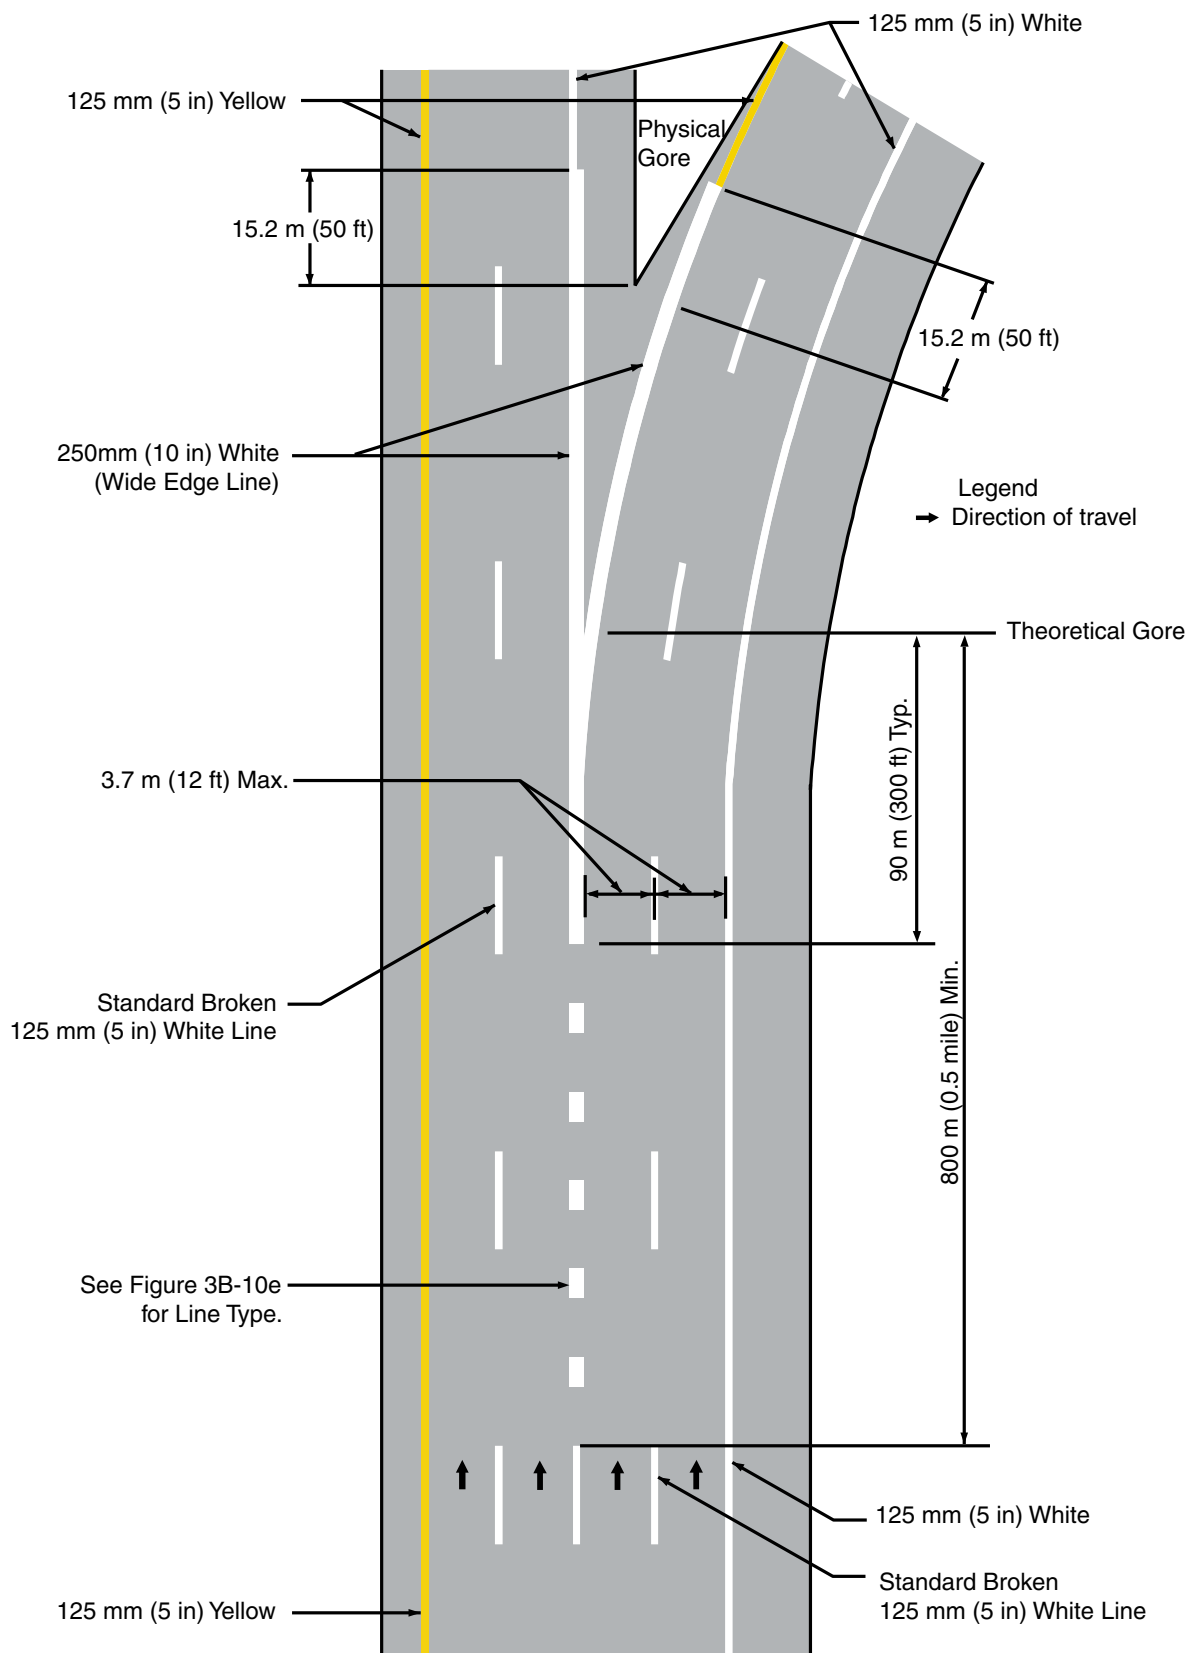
B-10d. Examples of Interchange Ramps Marking - Bifurcation (Split) - Recessed or Raised Pavement Markers.
